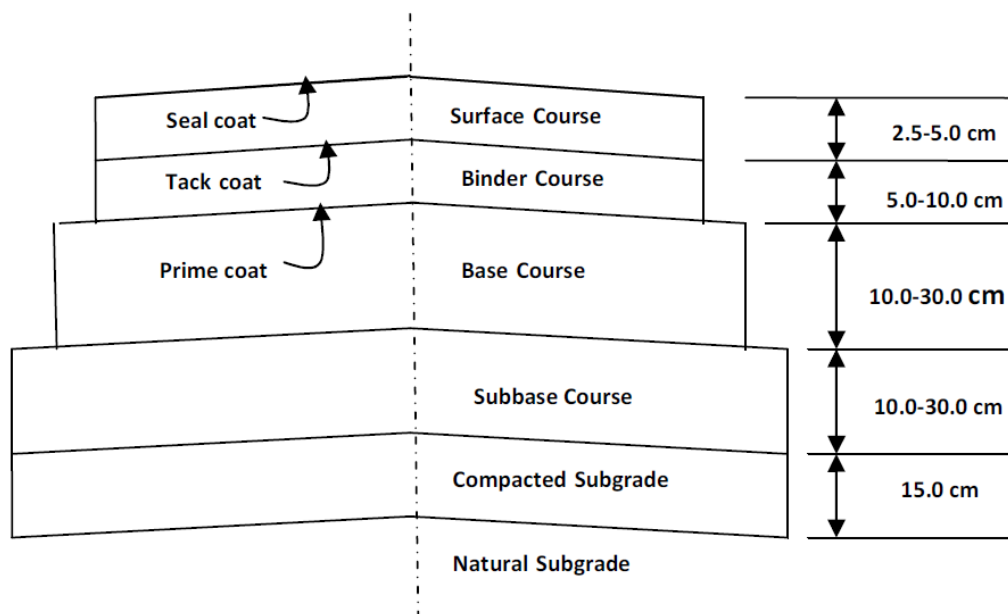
1 Typical cross section of a conventional flexible pavement. (After Huang, 2004)
